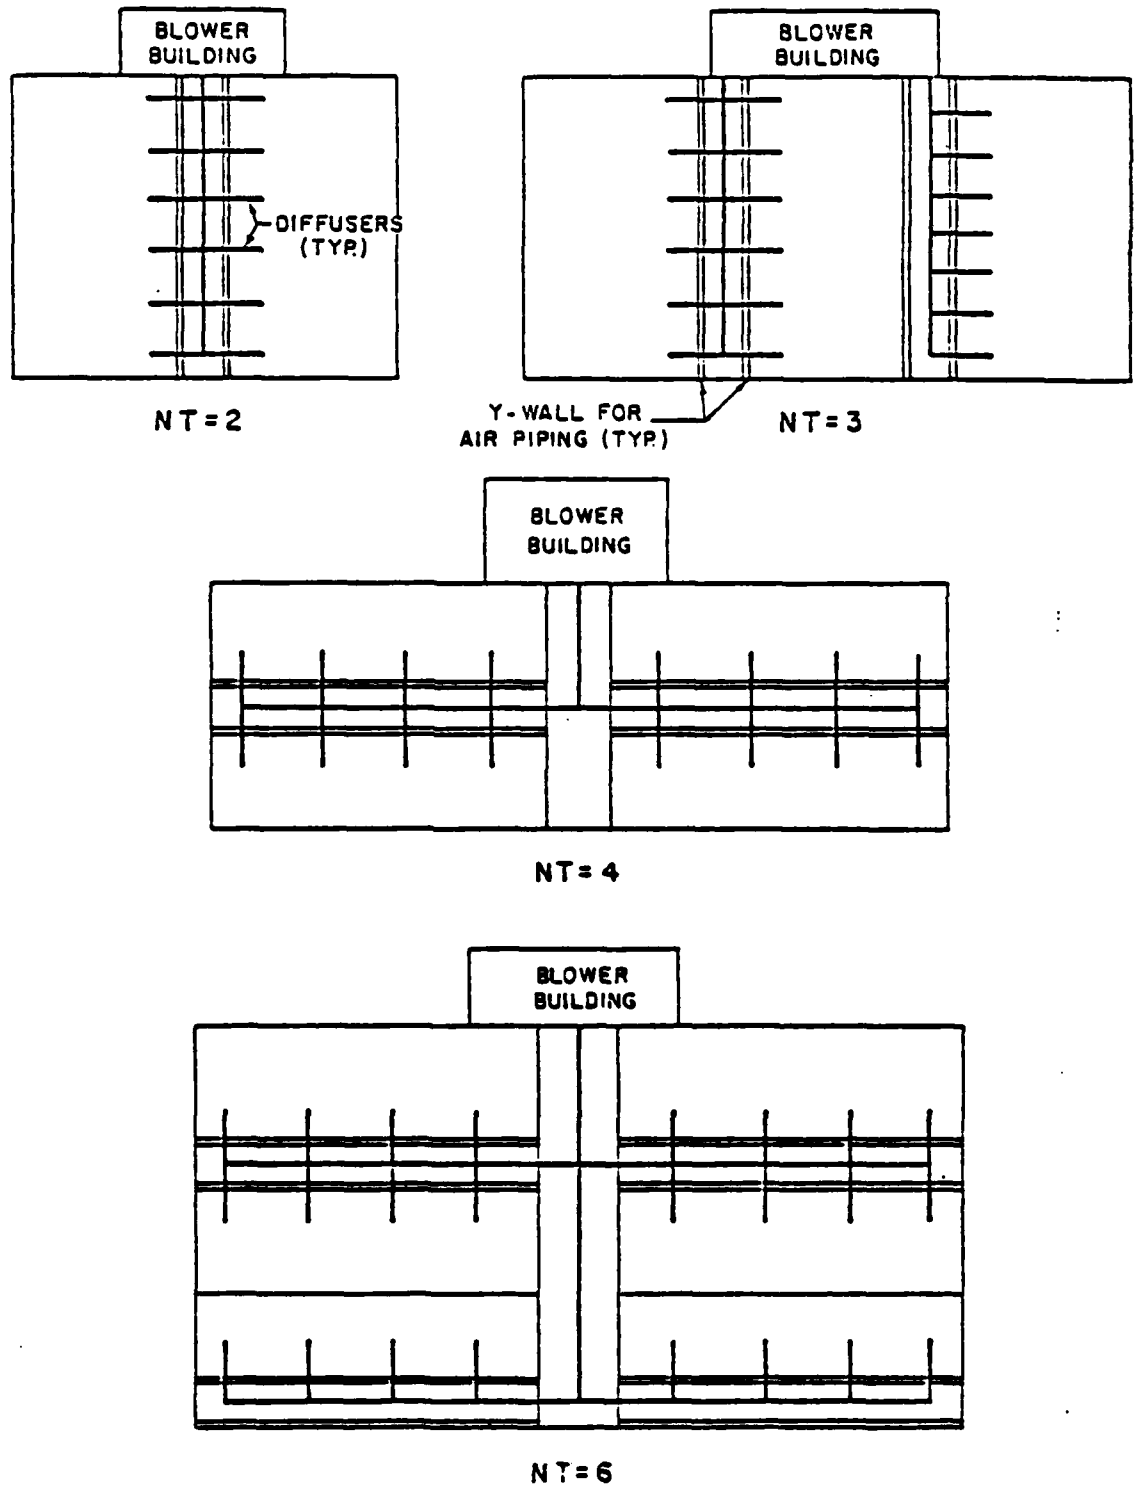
7 AERATION TANK ARRANGEMENT
